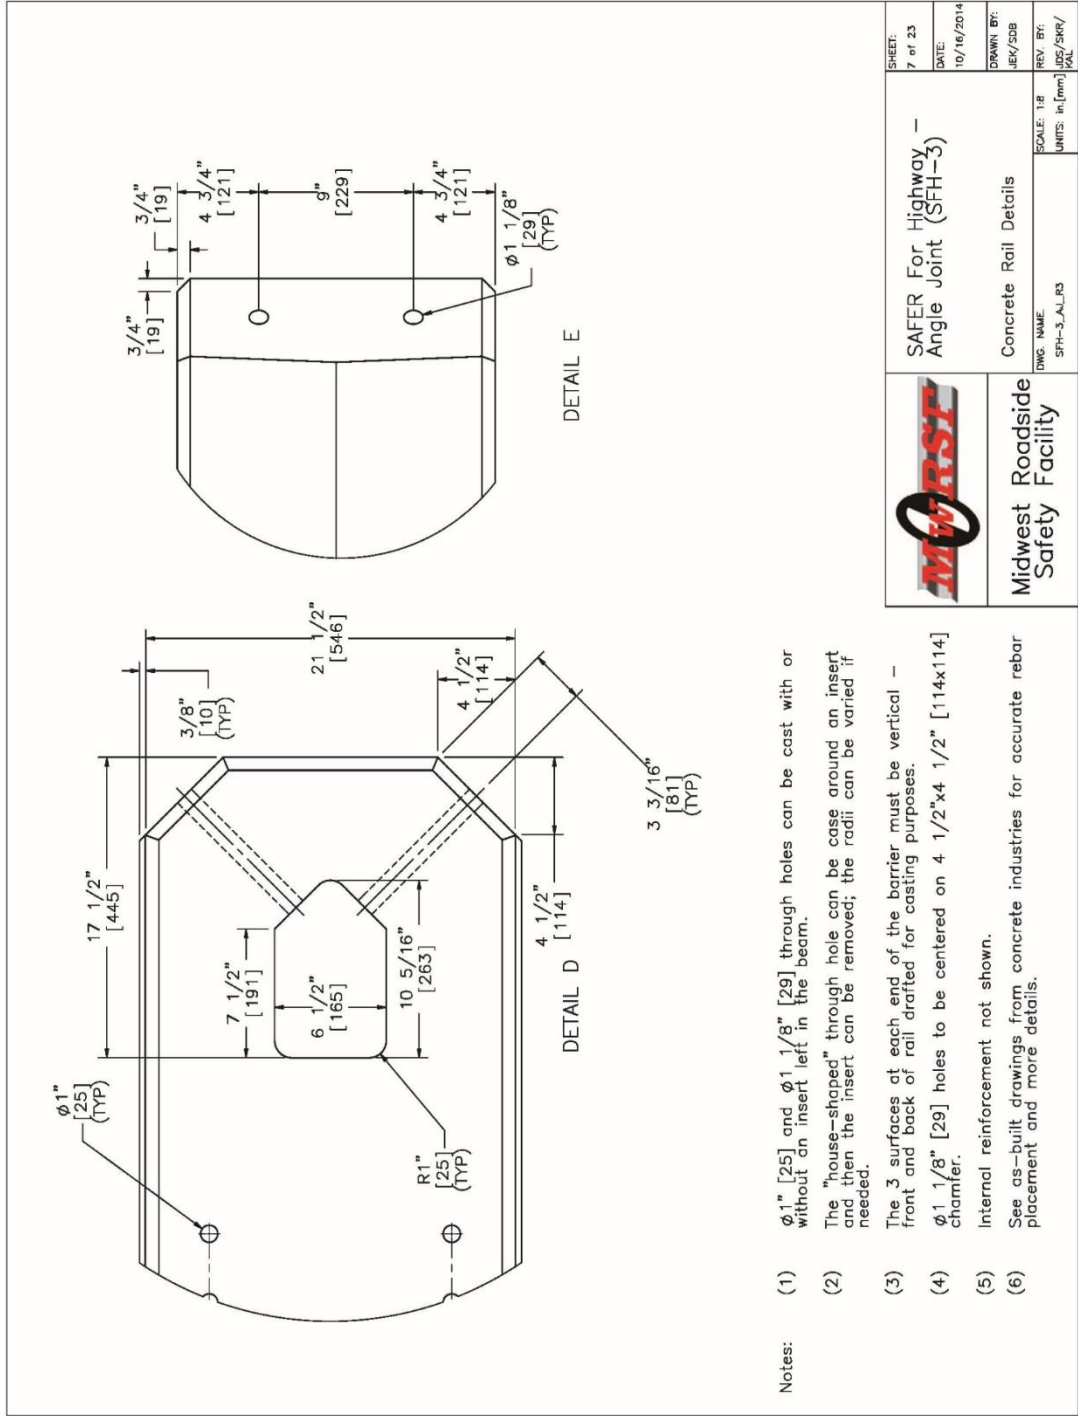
Concrete Beam Geometry, RESTORE Barrier [20]
